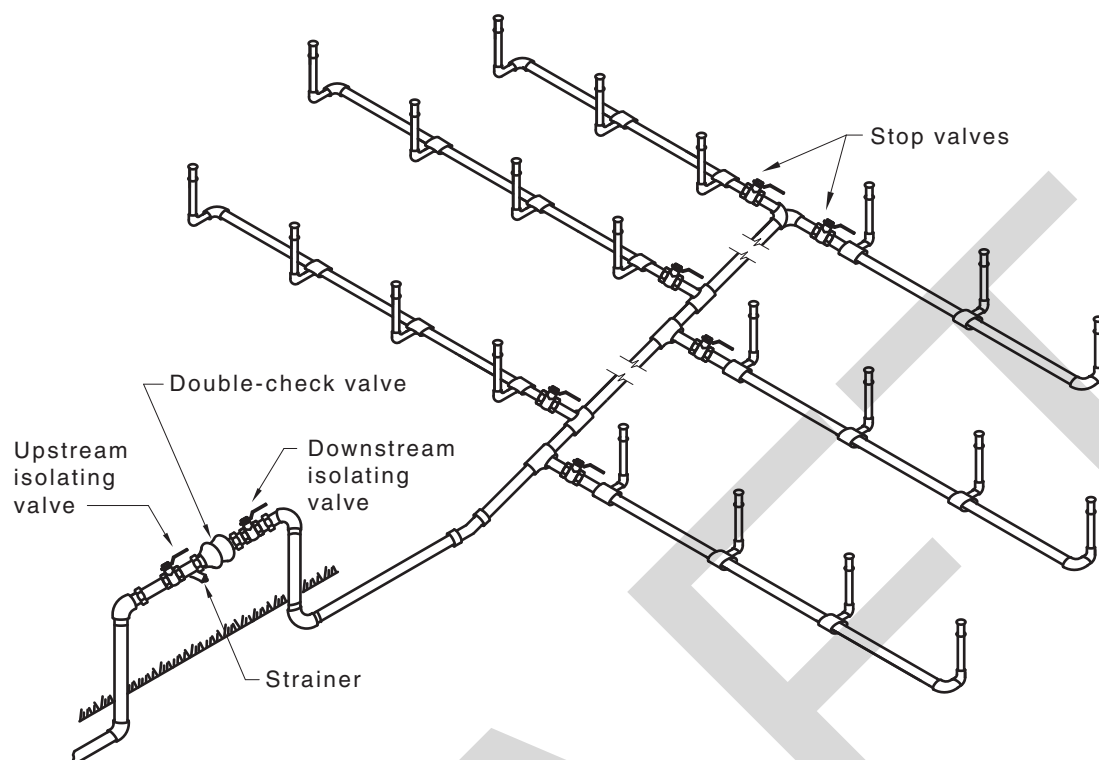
(E) TYPE C SYSTEM—TESTABLE DEVICES SUBJECT TO BACK-PRESSURE OR NO BACK-PRESSURE FOR HILLSIDE OR MULTI-ZONE SYSTEM—DOUBLE CHECK VALVE ASSEMBLY
